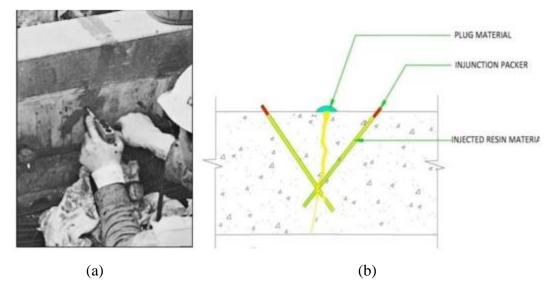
Injection of Epoxy: (a) Using a Gun That Does Not Require Fittings to Be Bonded to the Concrete Surface; (b) Section Showing Drilled Holes and a Crack Filled with Repair Material (54).
